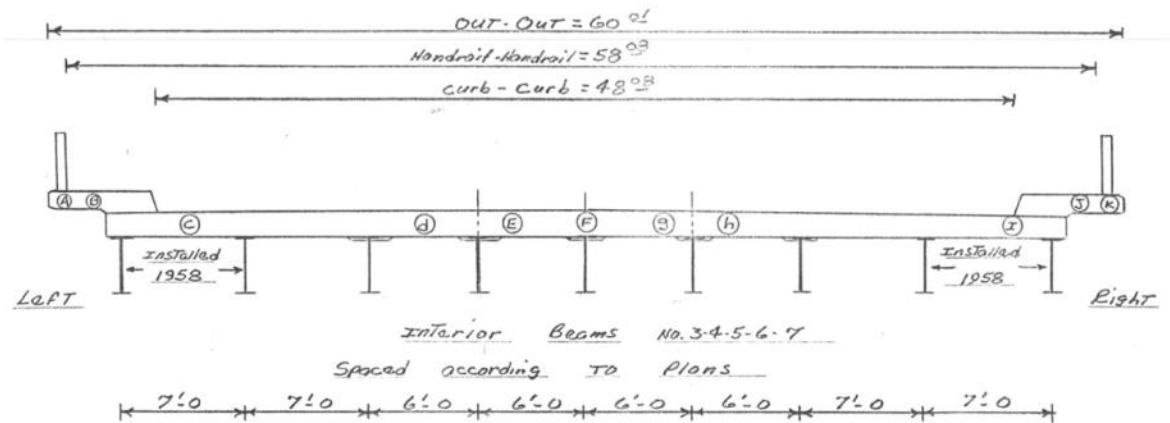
Cross-section of Deck O2 shows original and reconstructed (existing) structure.
